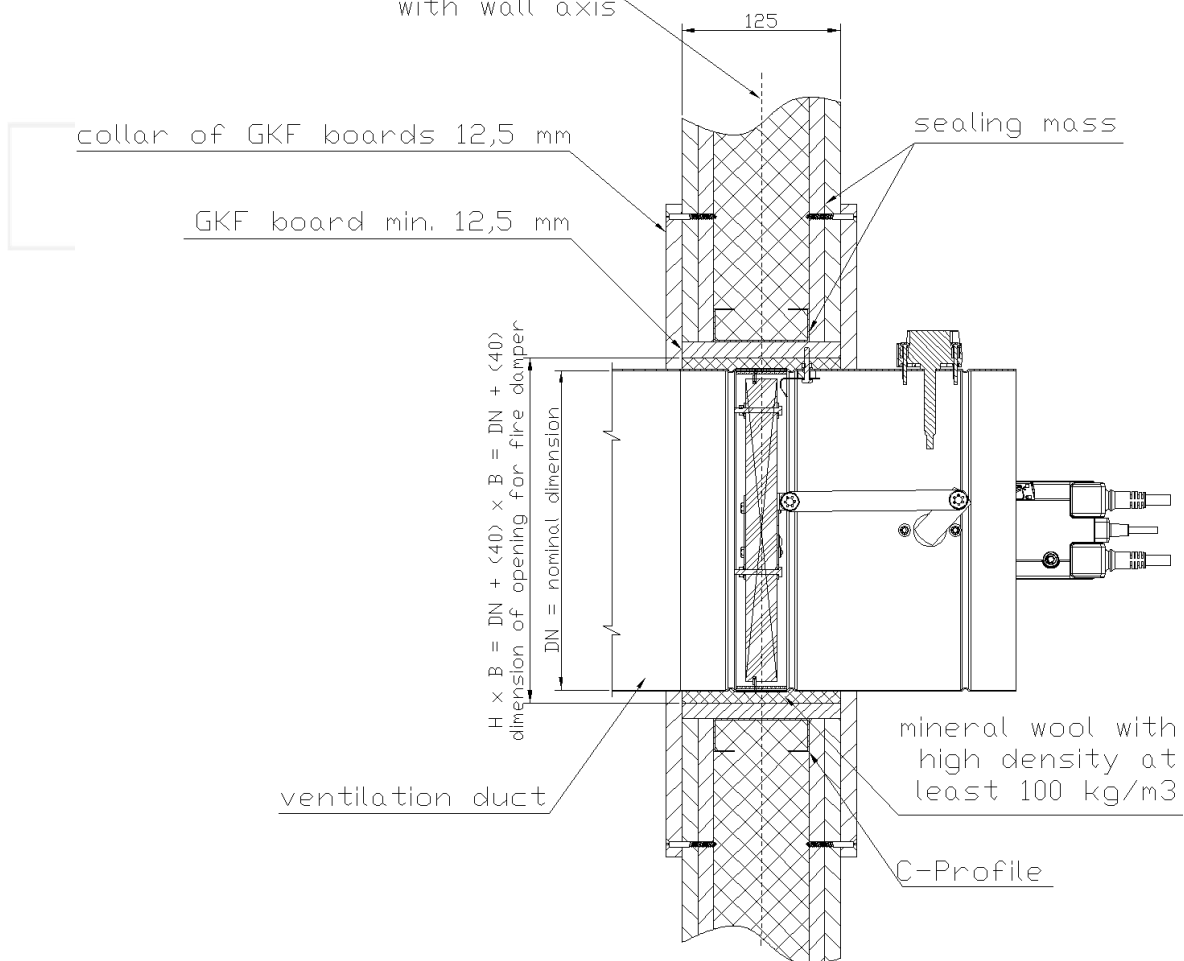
Installation method of fire dampers KTM-O in flexible wall with 125 mm thickness
